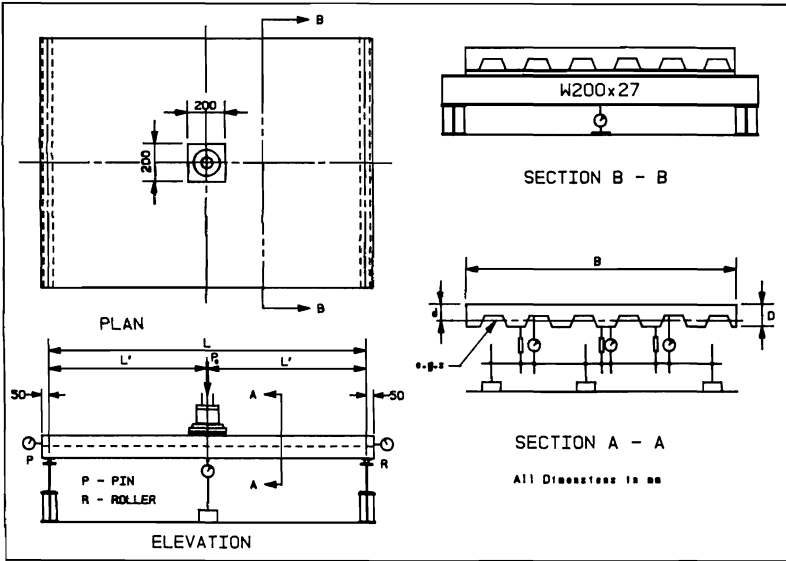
Schematic of Test Set-Up For Single Span Specimens
